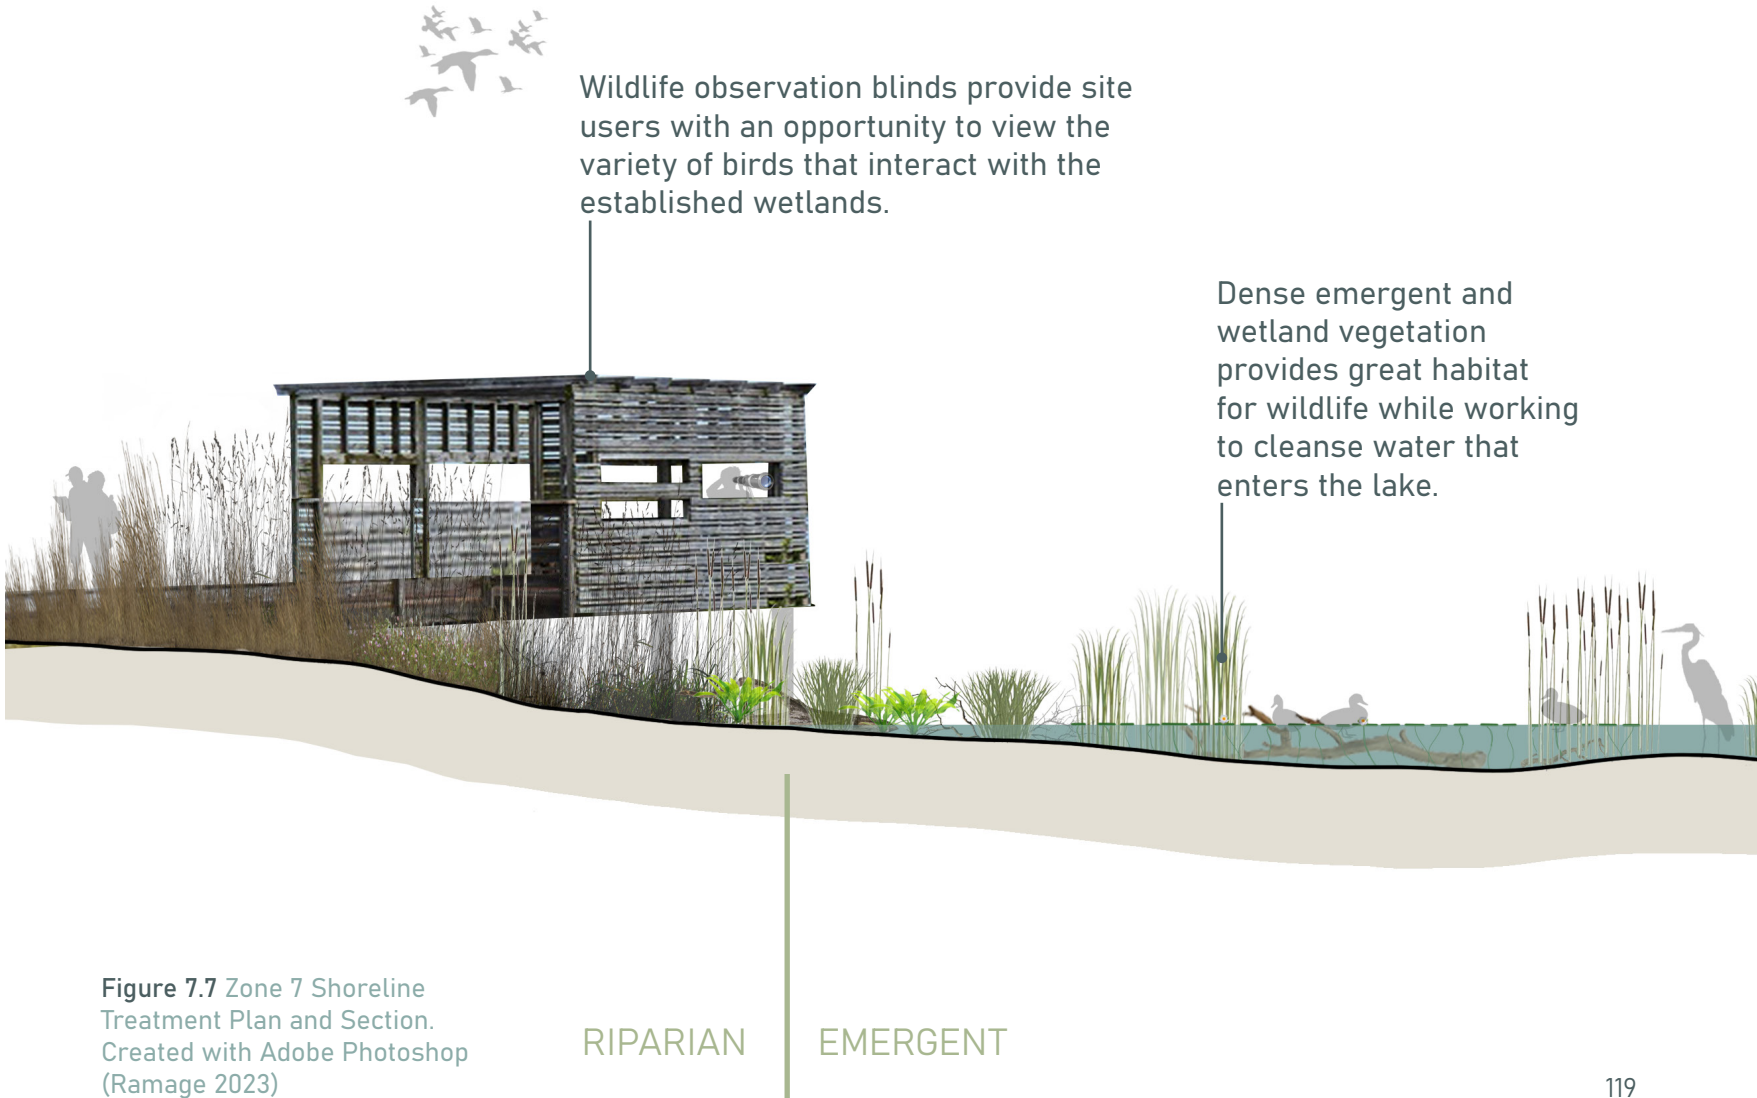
Zone 7 Shoreline Treatment Plan and Section. Created with Adobe Photoshop (Ramage 2023)
